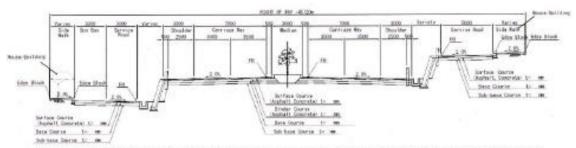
Typical Cross Section (Urban area near start point where existing ground is uneven)
